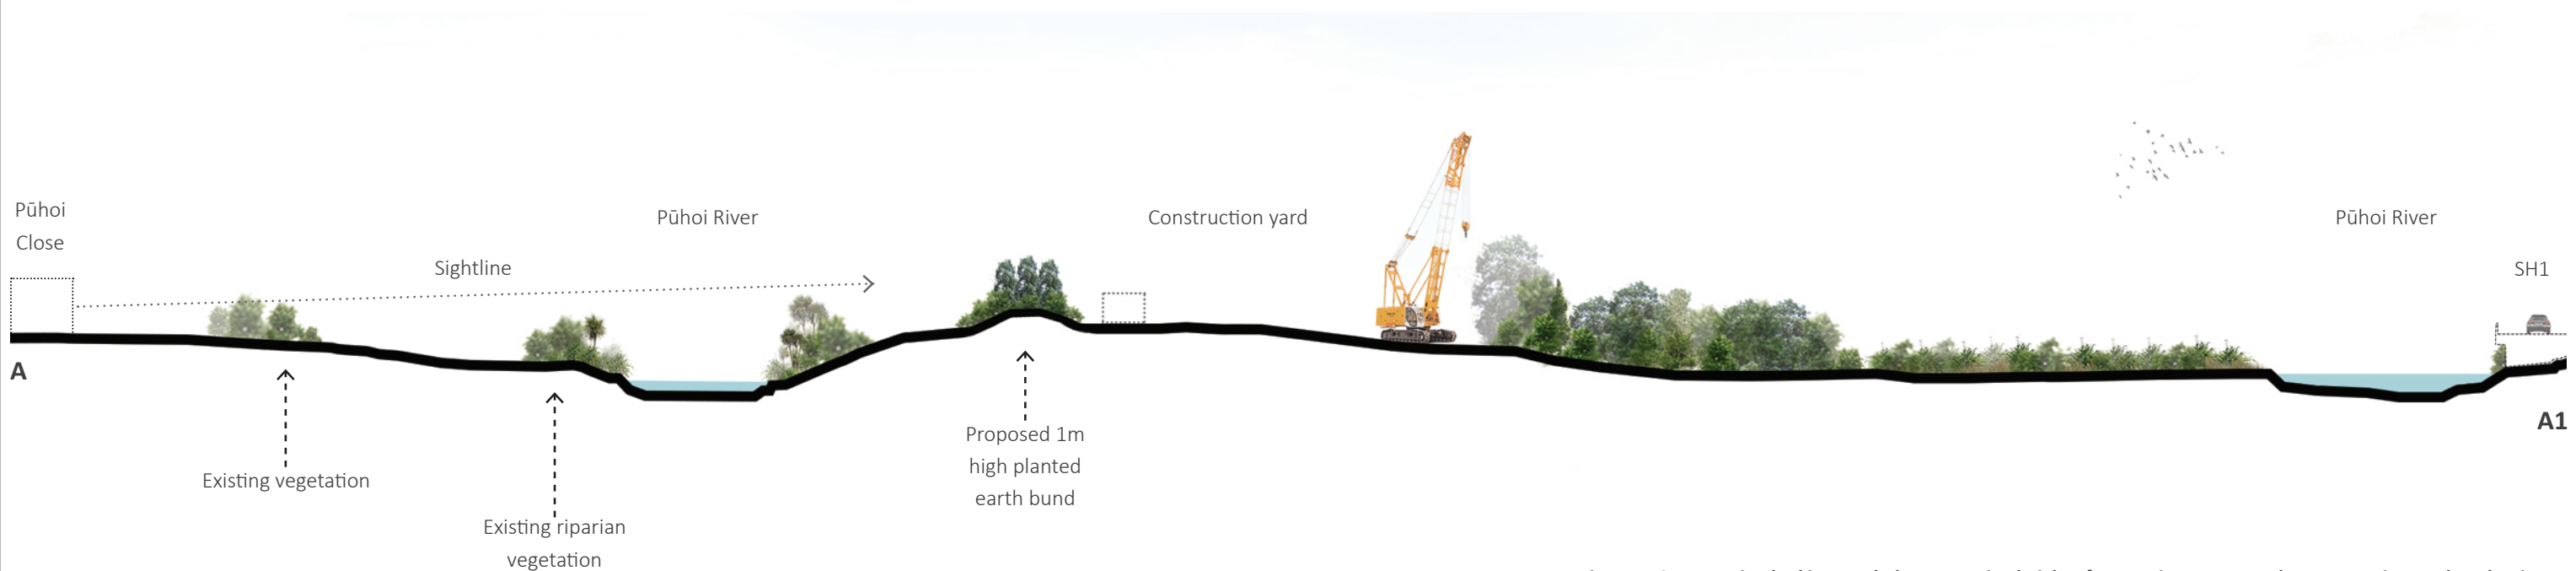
Cross section looking north demonstrating height of vegetation to screen the construction yard at planting (refer to page 1 for corresponding site plan) Scale 1:500 @ A3
